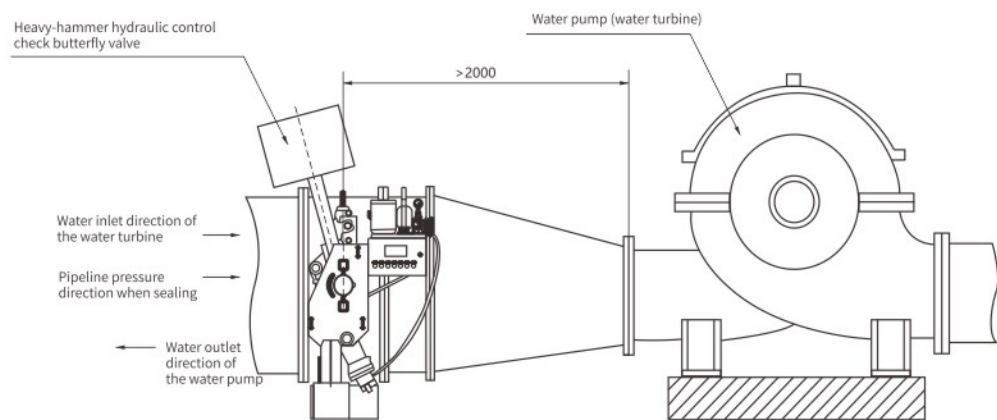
Heavy-hammer hydraulic control check butterfly valve (forward installation)
